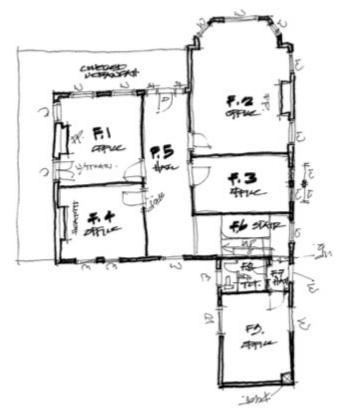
Figure NNNN First Floor plan of Willow Grove illustrating the room codes. Source: Christopher Roehrig May 2017.
